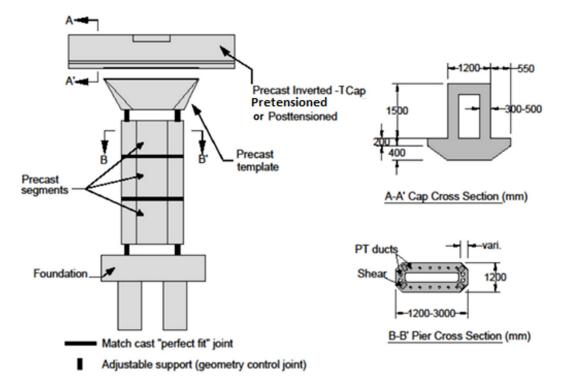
Precast segmental columns and precast prestressed/posttensioned bent cap (Source: Shahawy 2003)
